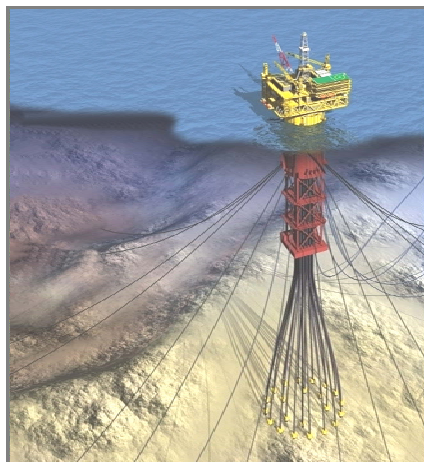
An example of a truss spar and its mooring/riser configuration.
